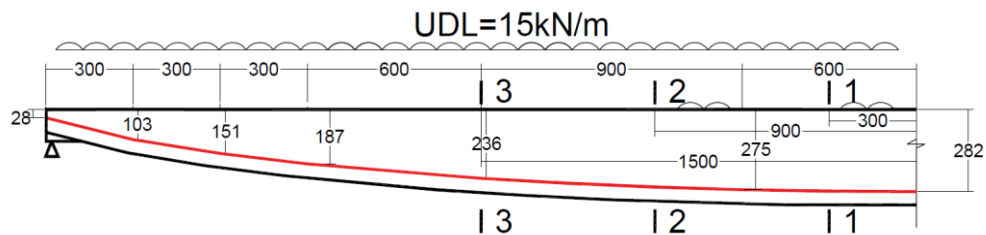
The schematic diagram of the calculation example (showing half the beam span).
